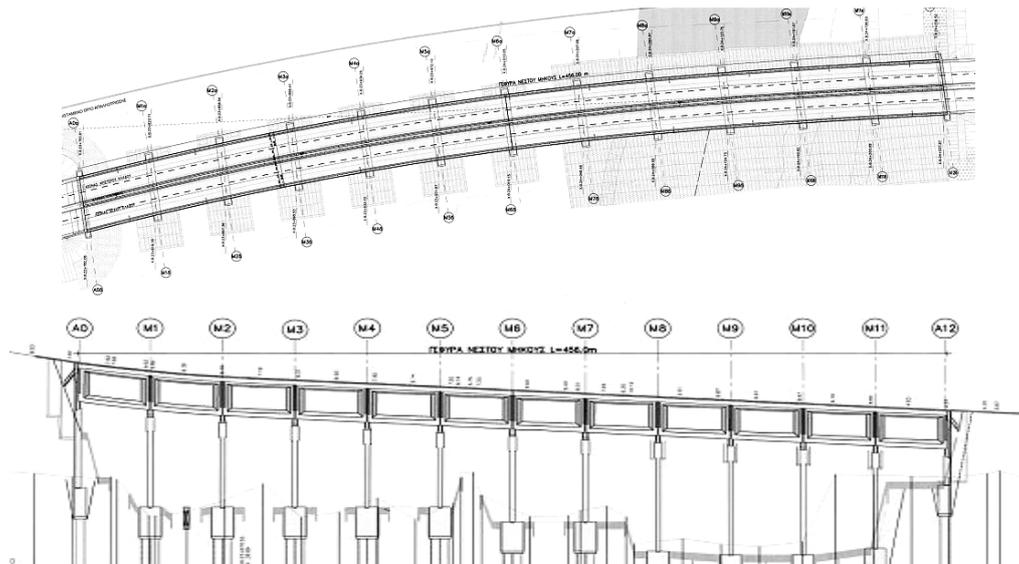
Plan (above) and longitudinal section (below) of the Nestos-bridge.
